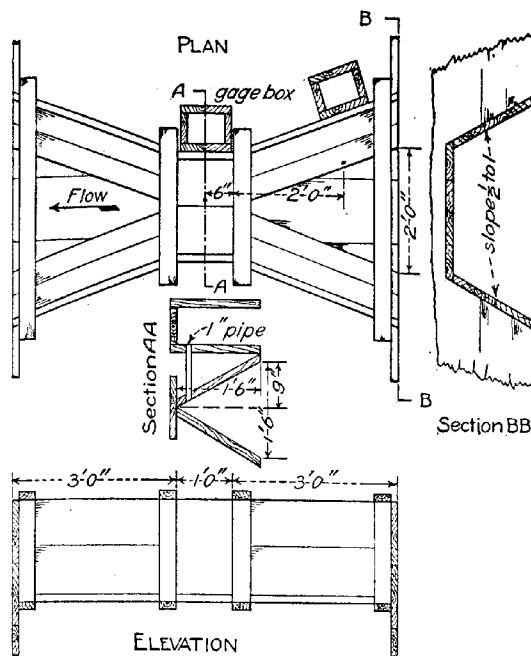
Plan, elevation, and sections of the V-notch Venturi flume.
